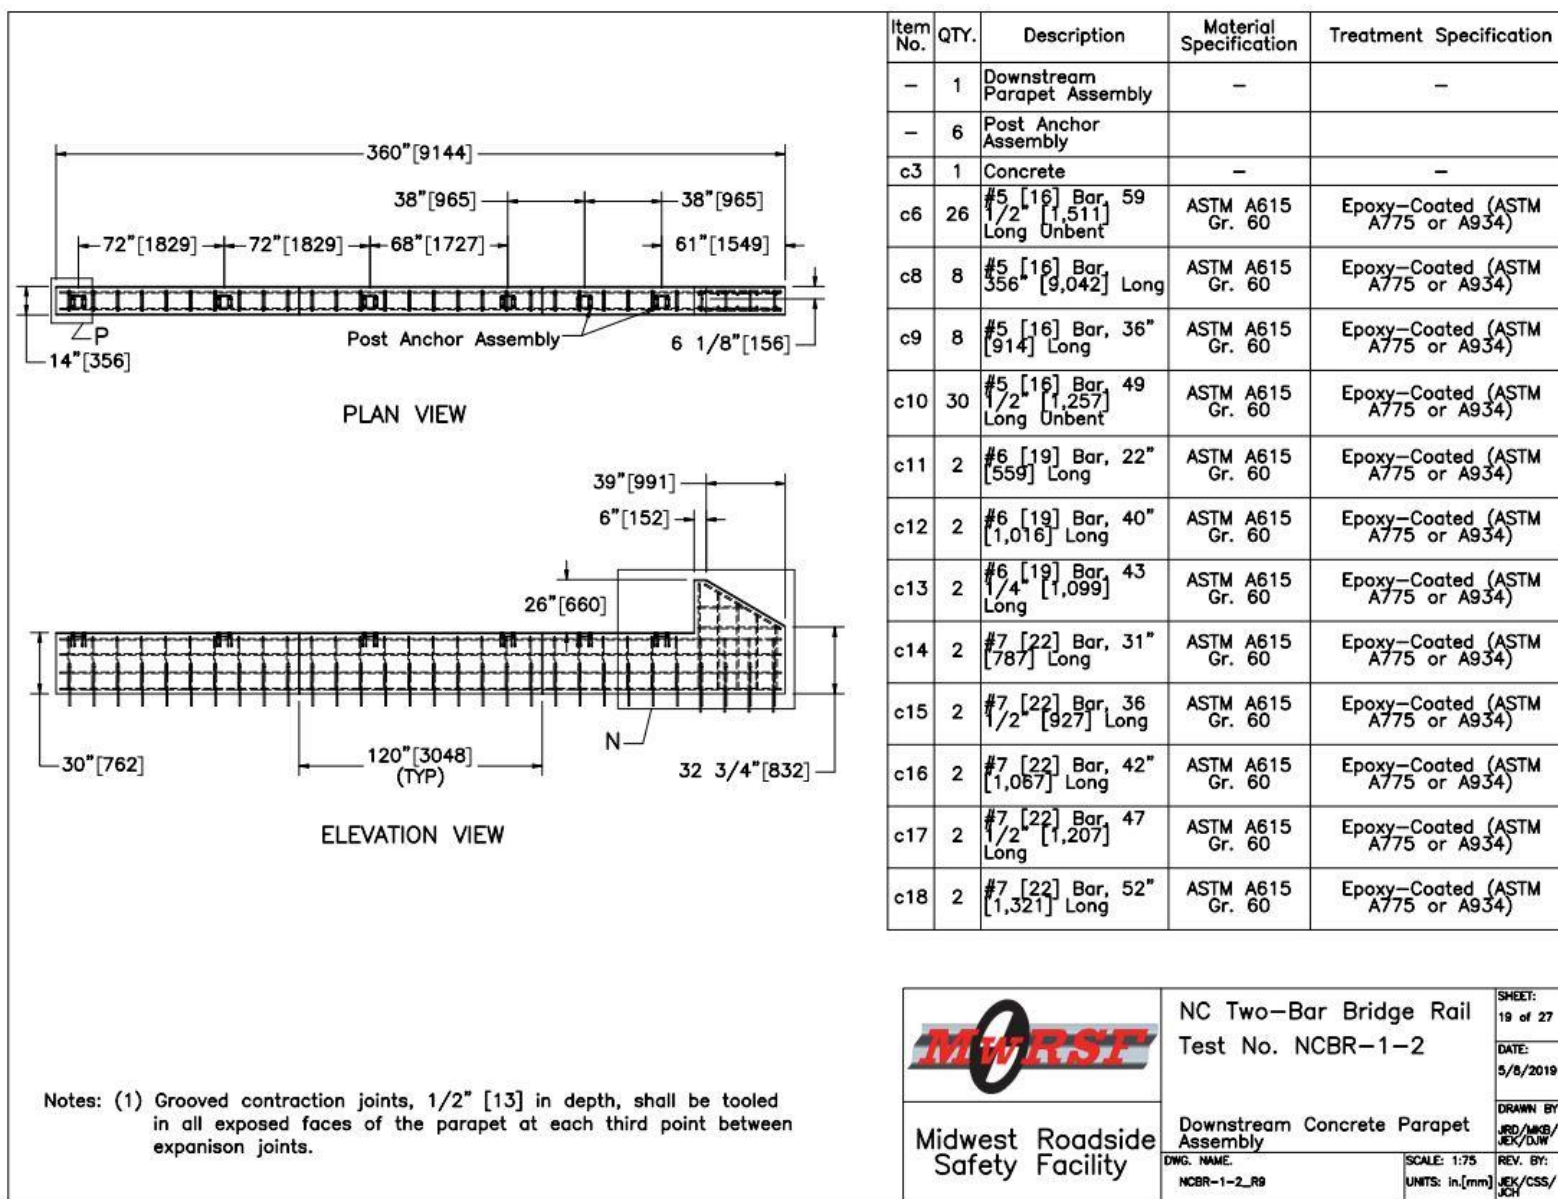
Downstream Concrete Parapet Assembly, Test Nos. NCBR-1 and NCBR-2
